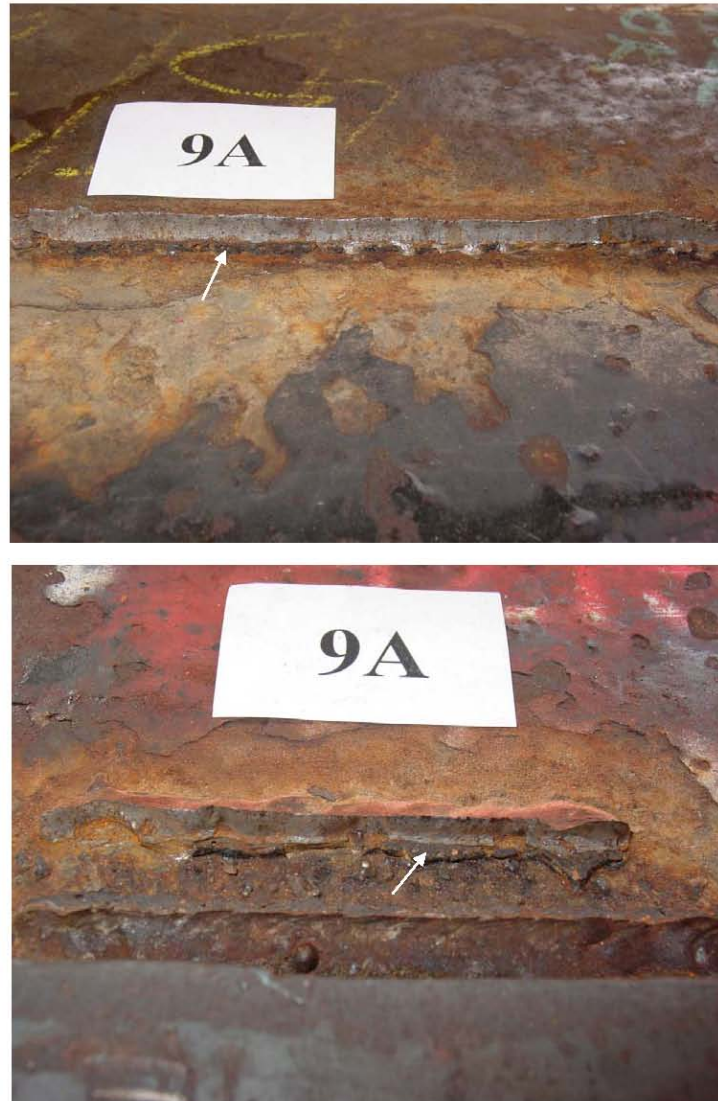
Enlarged Views of Cleaned Weld Fracture on Base Plate 9A Showing Ductile Weld Metal Fracture. Note Weld Metal Flow Into Weld Root Opening (see arrows).
